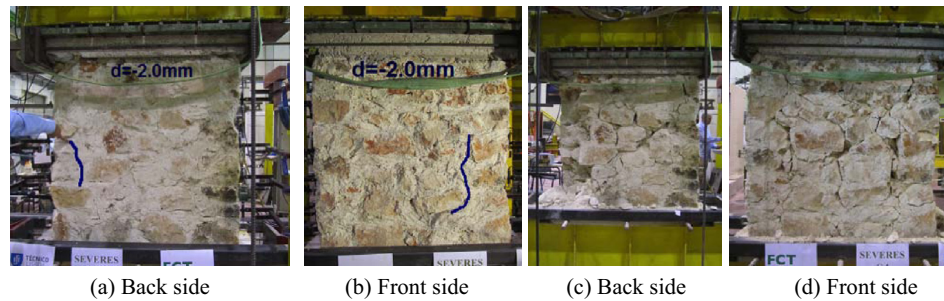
Specimen S4. First visible crack (a and b). Collapse mechanism (c and d).
